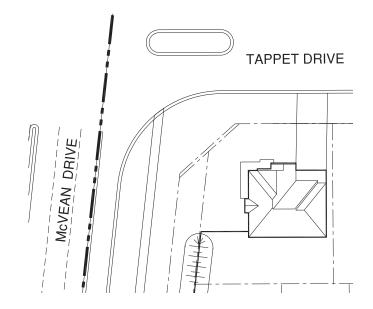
Conceptual Plan of Neighbourhood Gateway Dwelling at McVean Dr.
